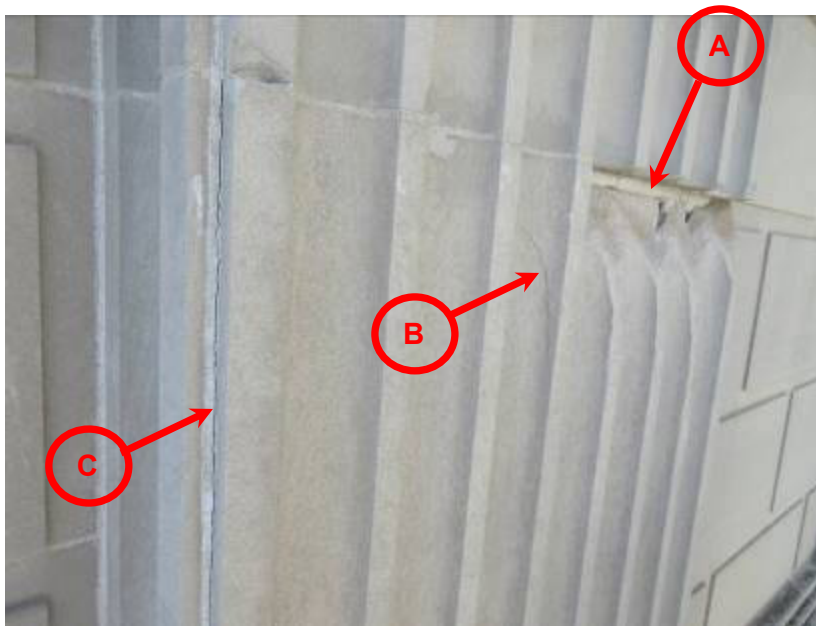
(A) Previously removed spall and (B) new cracks in stone unit on Drop #18b. Note (C) separation in mortar joint.
